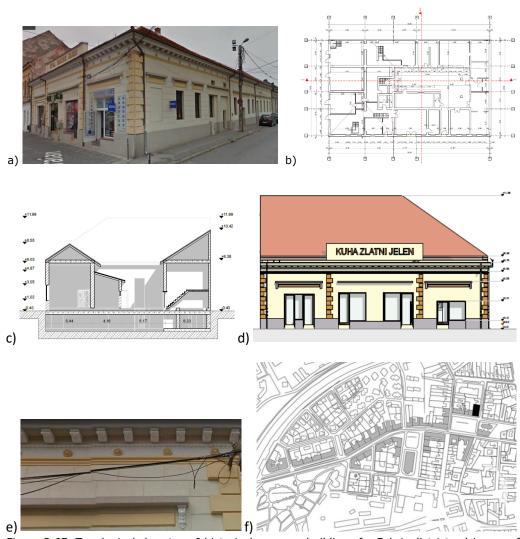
Typological class type I historical masonry buildings for Fabric district: a) image of the buildings in the current state; b) ground floor plan; c) section; d) façade; e) architectural-artistic elements; f) location
